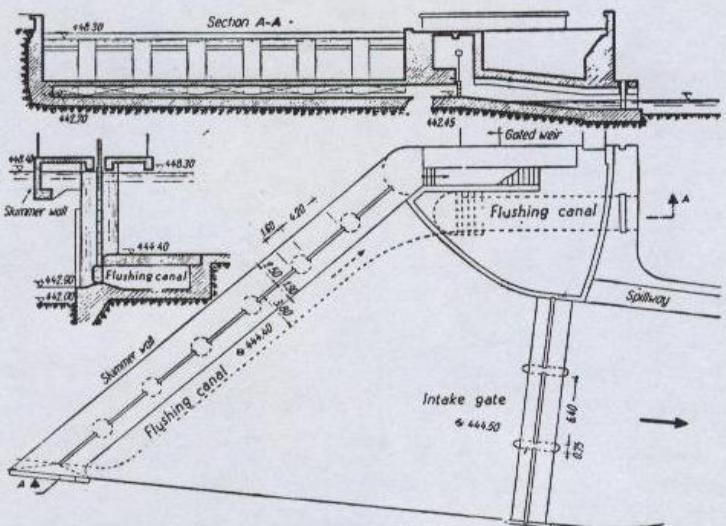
/21. Intake structure with flushing running parallel to the intake sill. Mixnitz power plant, Mur River, Austria
